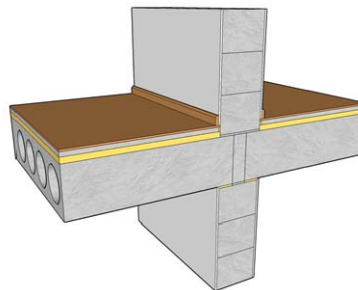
Massive wall structure and concrete floating floor on hollow-core panels
